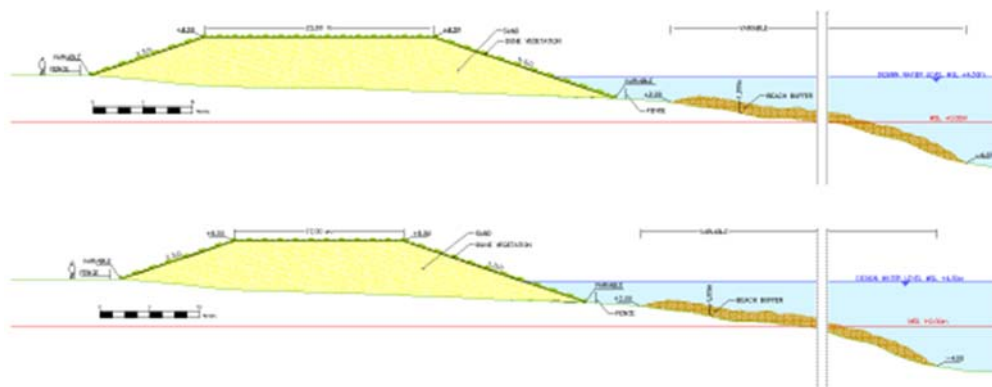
Typical cross-sections of the dune design. Top figure: east, bottom figure: west and central
